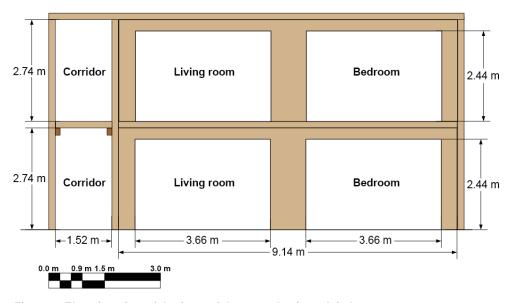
Elevation view of the front of the cross-laminated timber test structure.
